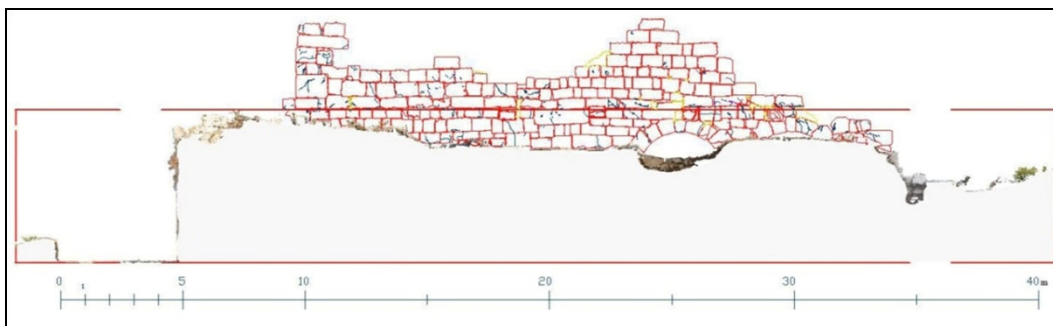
Hand-drawing of Hurmalik Bath Western Façade and elevation based on the orthophoto and 3D model.
